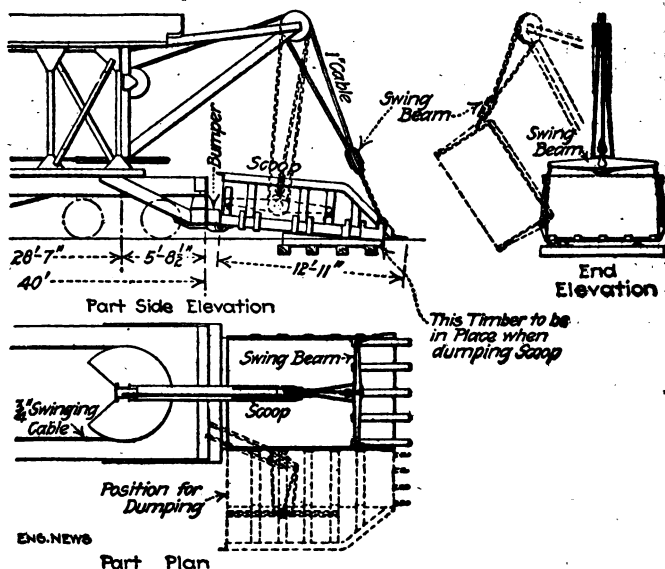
Front End of Scoop Car Showing Attachments when Excavating and Dumping.
